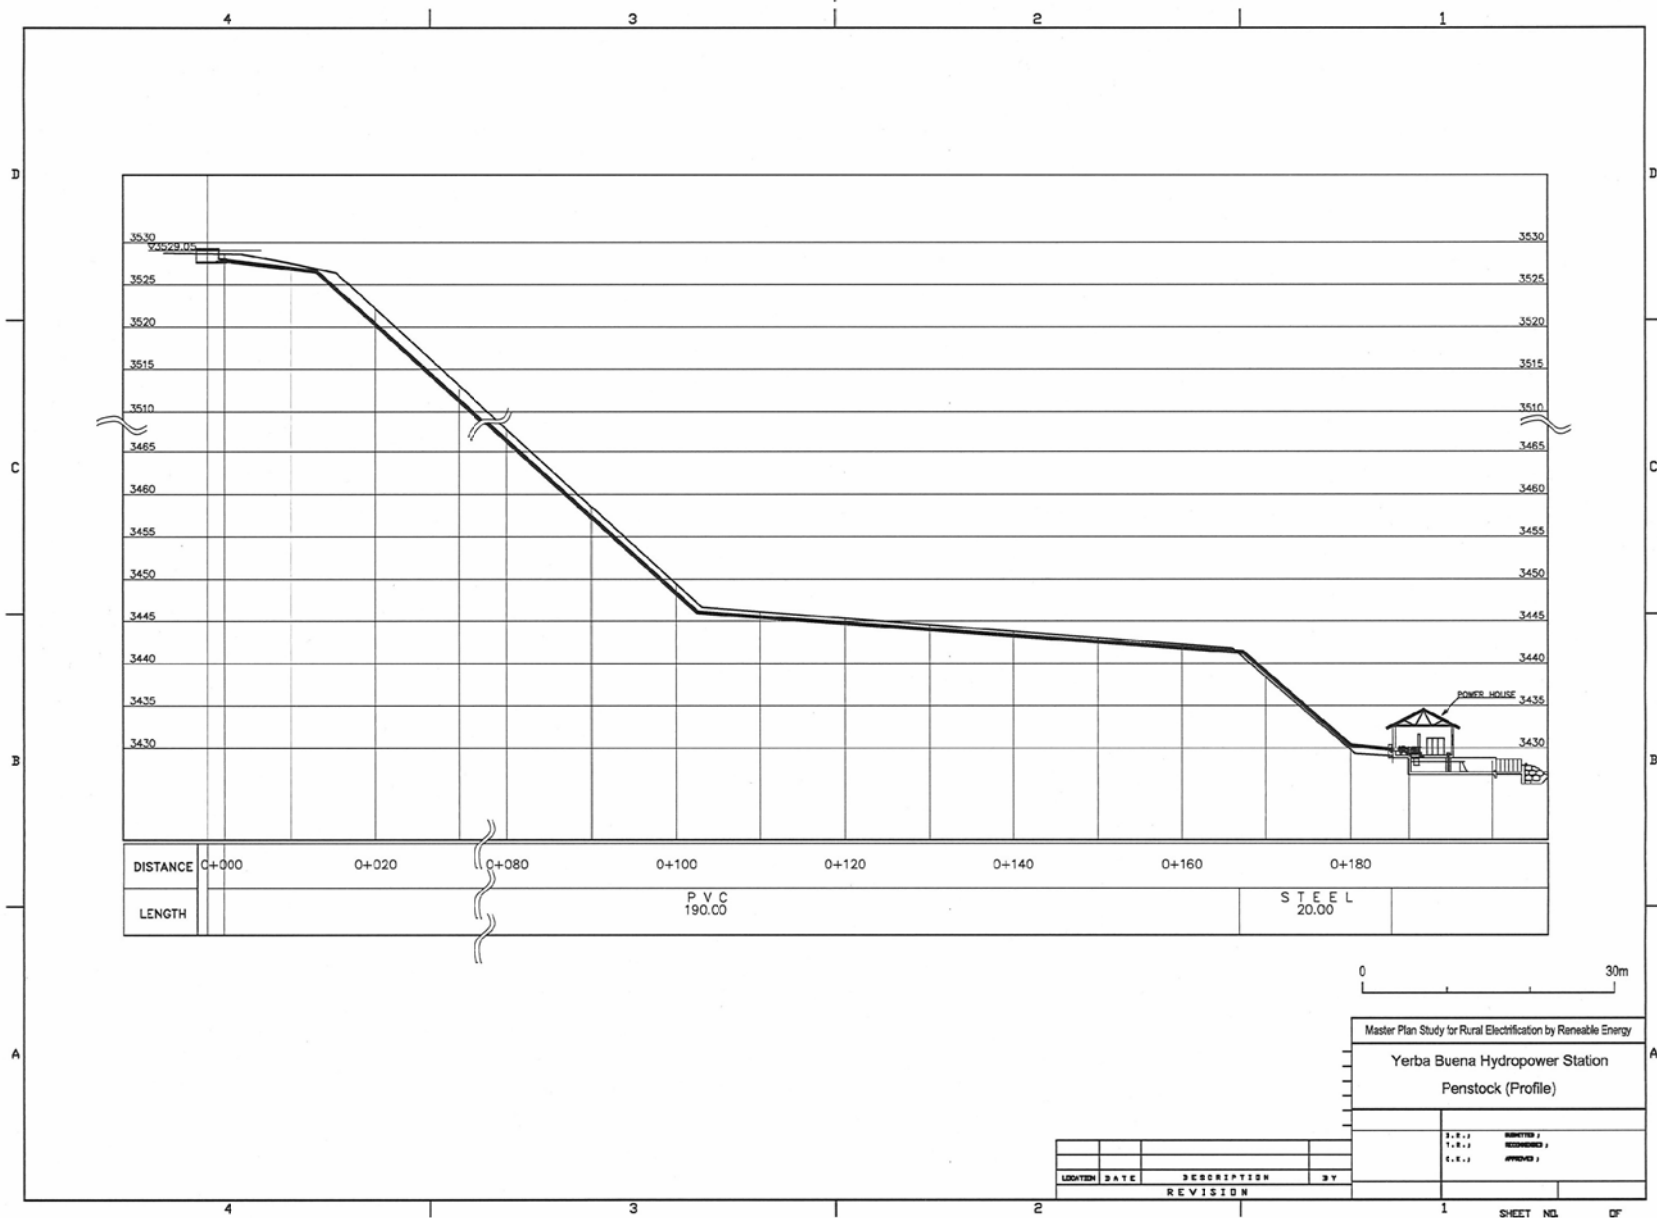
Rough Design Drawings of Penstock (Profile)
